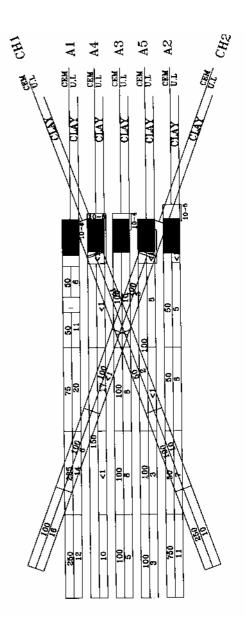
DETAILS OF TRIAL GROUTING IN 0+430 FROM LEFT OF THE DAM
